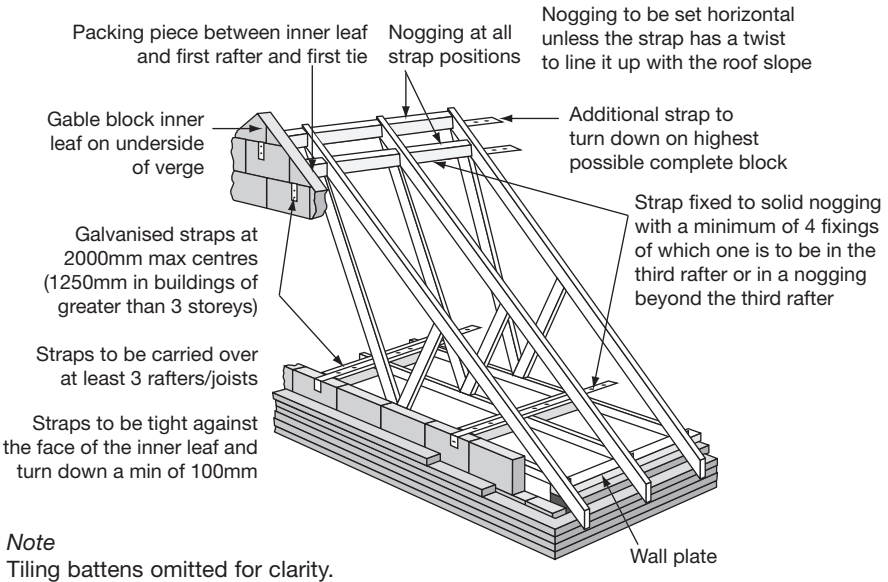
Connections suitable for truss roofs to masonry gable walls
